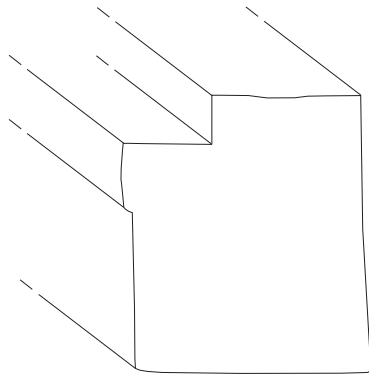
Sketch of the end of a probable jamb stone, reused in the façade of city wall II, 1:10.
